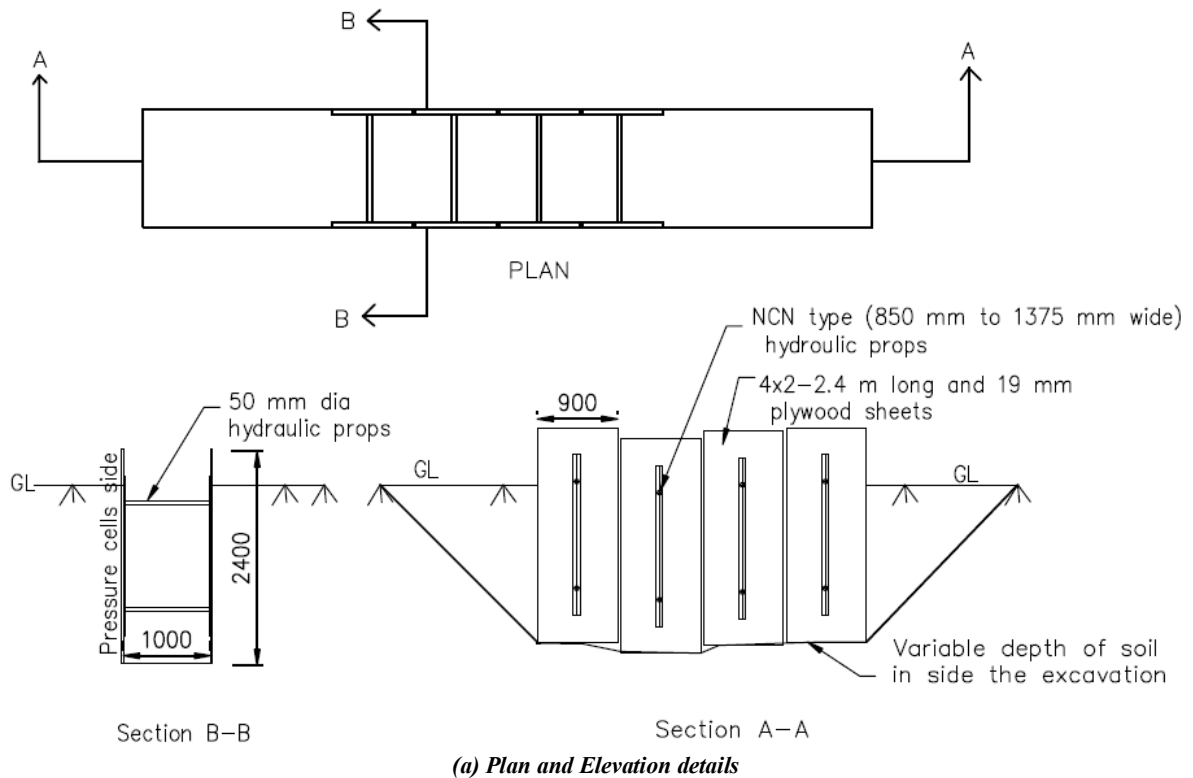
Test setup details for Hydraulic shoring (with plywood sheeting) in trench excavation.
